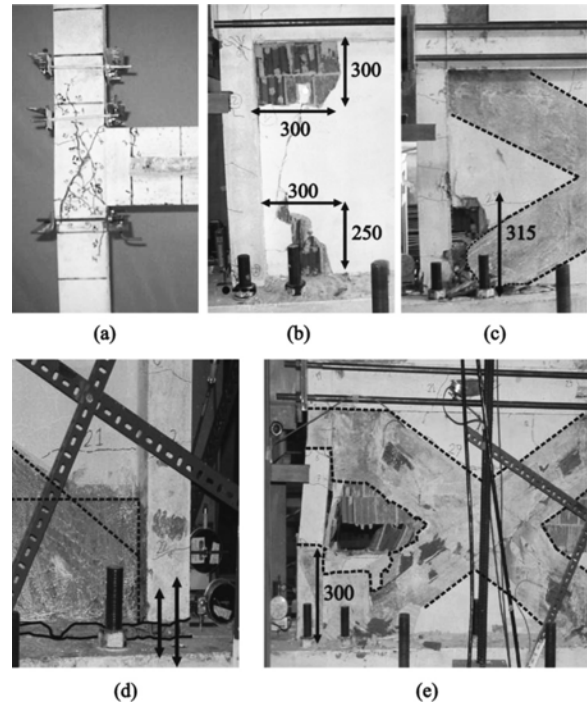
Close-up views of local failures: (a) Specimen B; (b) Specimen I; (c) Specimen IX; (d) Specimen IXF; and (e) Specimen IXFC. (Note: Dimensions in mm; 1 mm = 0.0394 in.)
